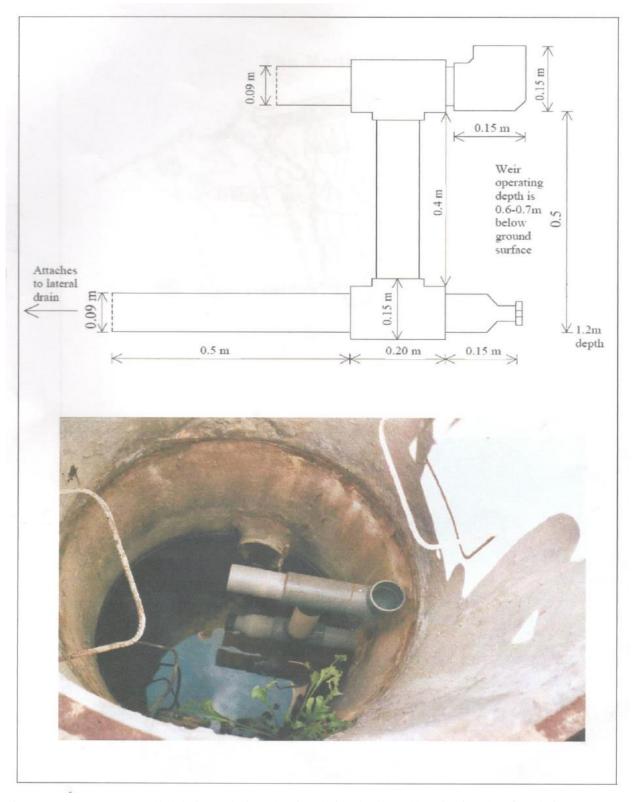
Prototype controlled drainage device, showing design details and location in subsurface drainage access manhole.
